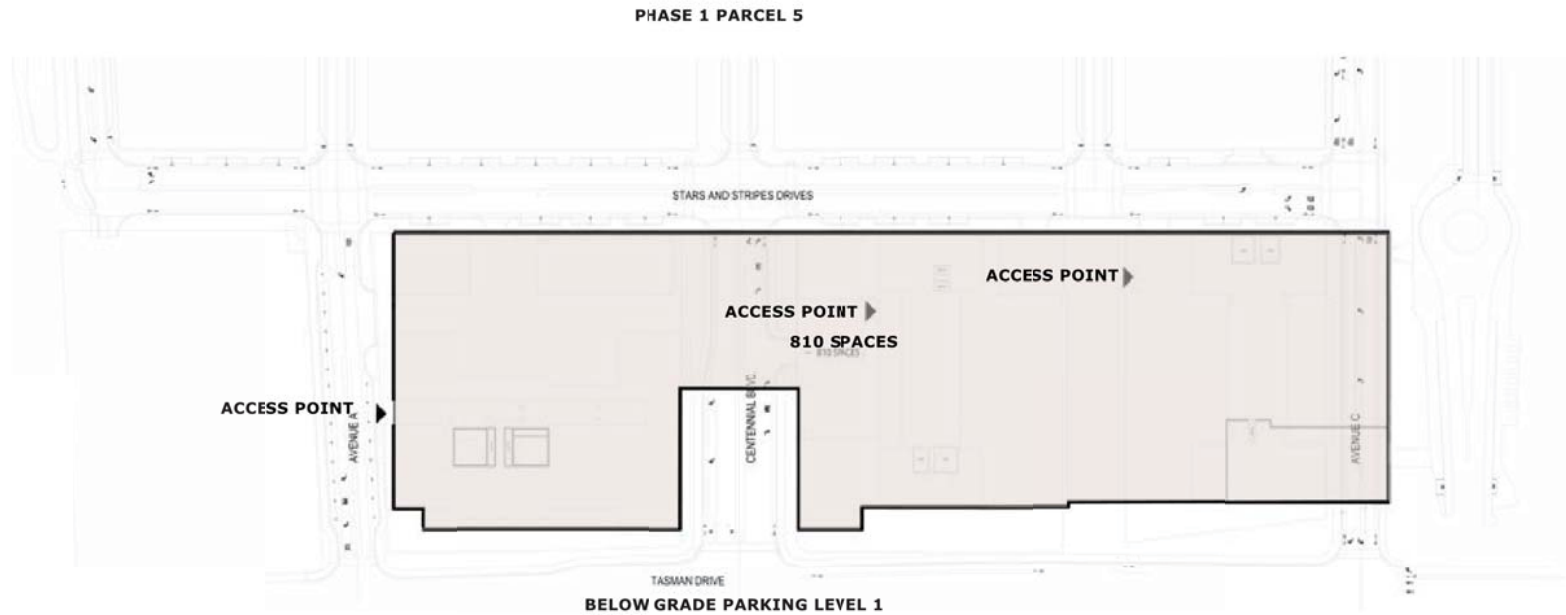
SITE PLAN. LOCATION OF POTENTIAL USES
